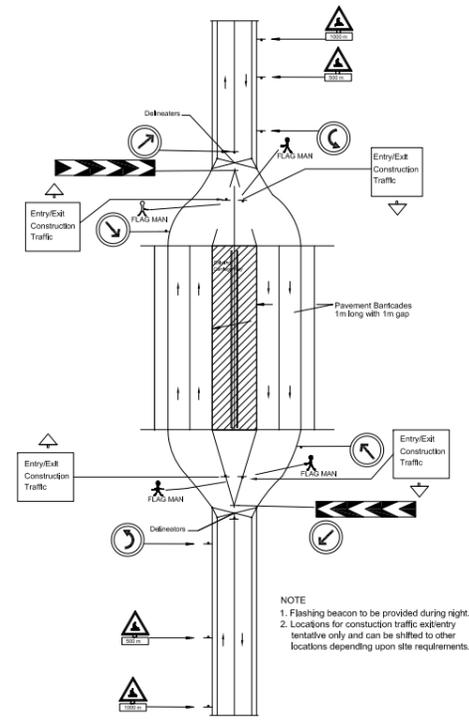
Layout of Traffic Control Devices for Urban Section (Stage - 2) Construction of 4 Lane divided Carriageway
